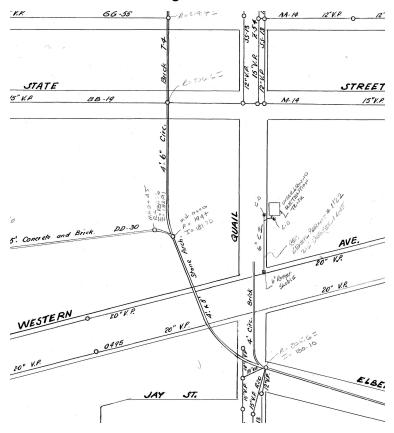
Portion of Sewer Atlas Sheet No. 036
